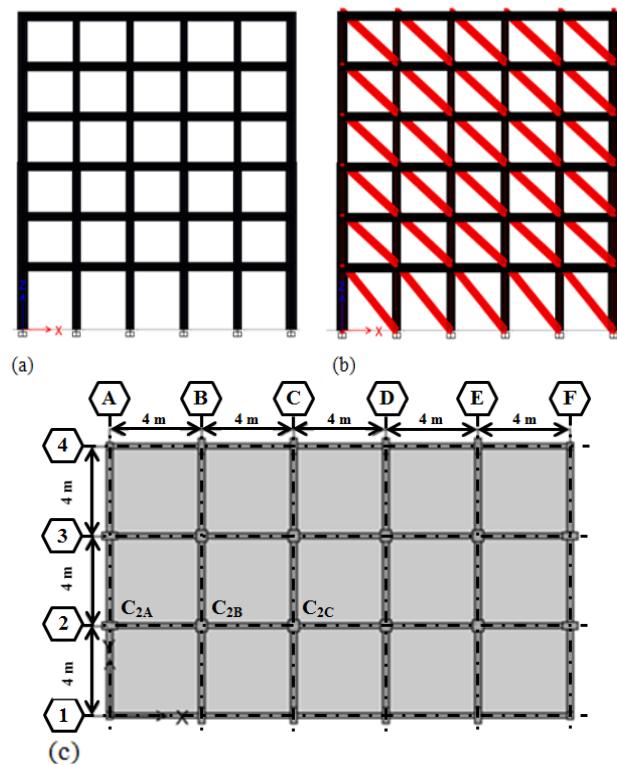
Schematic representation of (a) Bare frame (b) Masonry Infill Frame (c) and typical floors Plan of the 6-storey residential building
